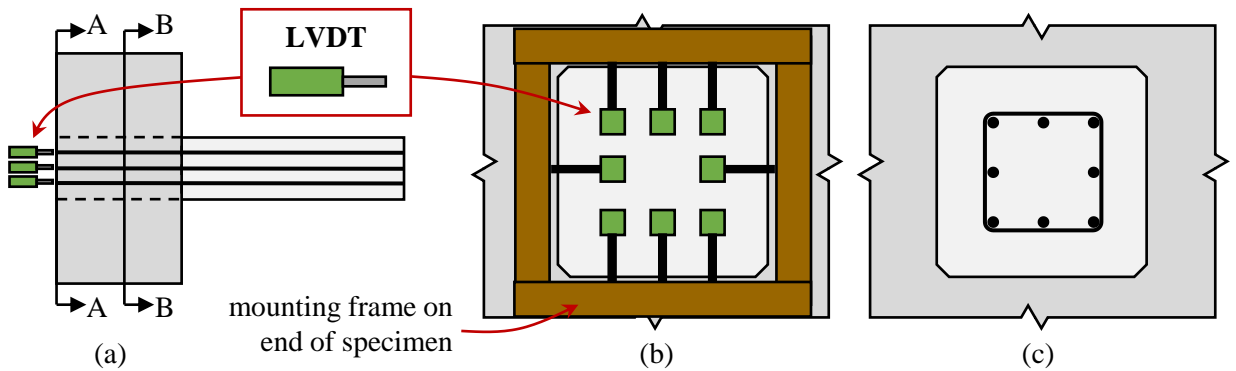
LVDTs used by Shahawy and Issa [17] to measure strand slip (a) elevation, (b) section A-A and (c) Section B-B
